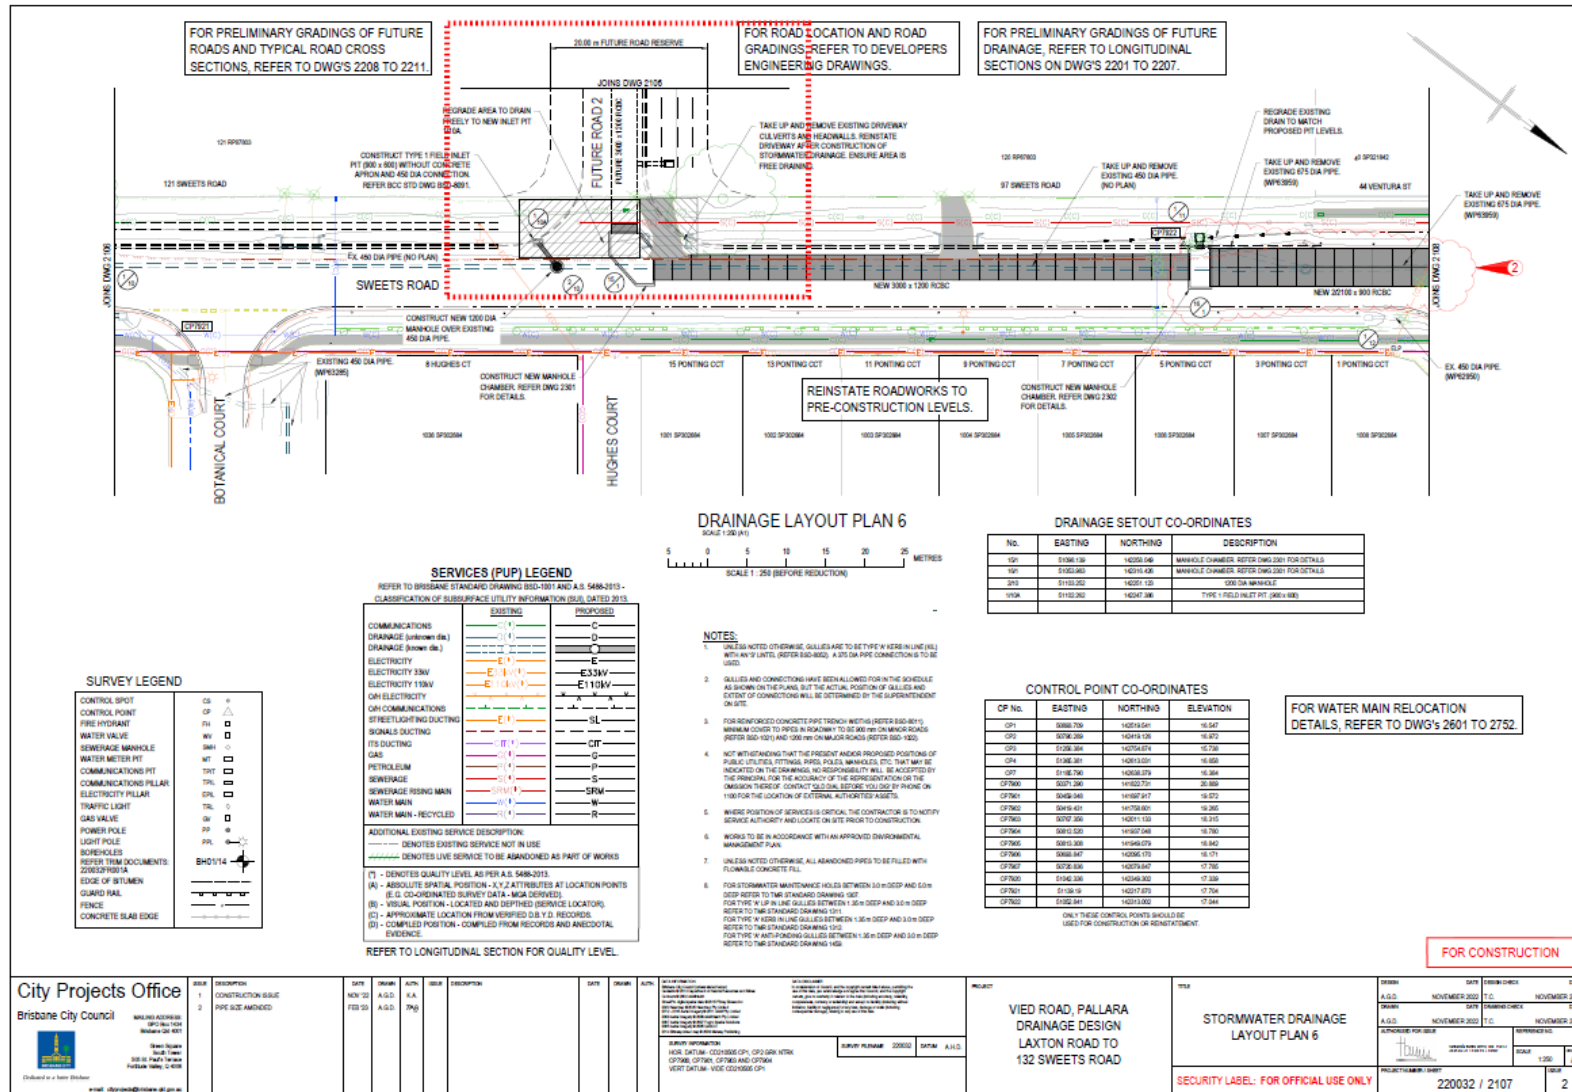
Copy of LGIP PFTI Stormwater Draining Layout
